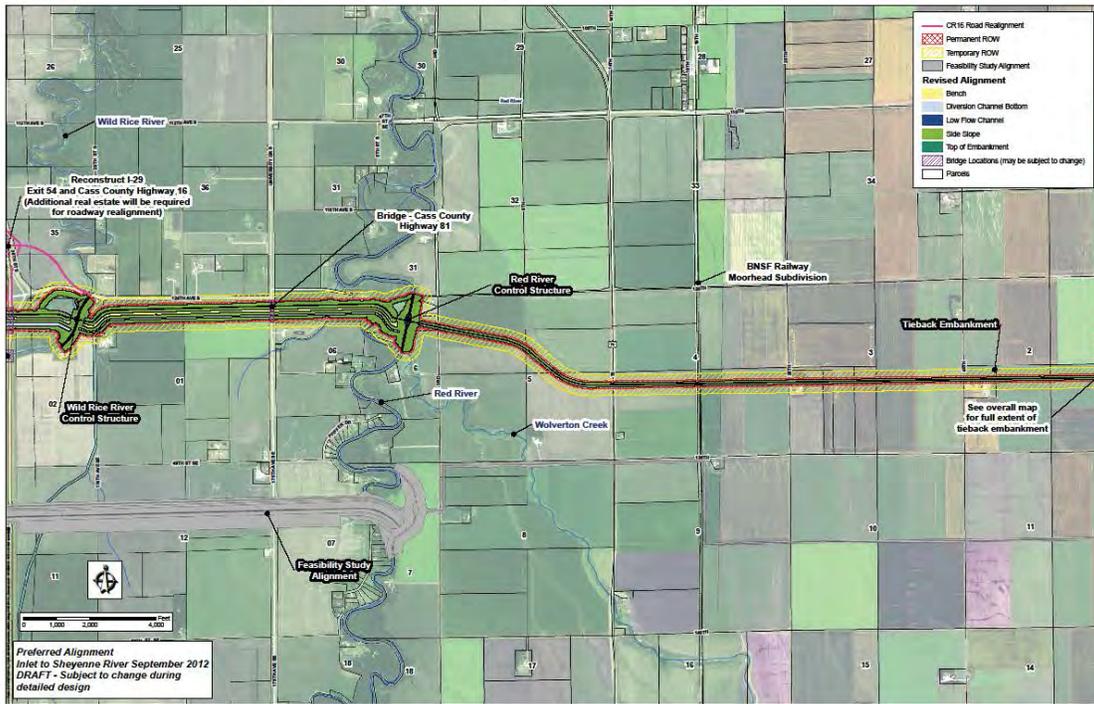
Proposed Southern Alignment – Red River Control Structure to Minnesota Tieback Embankment
